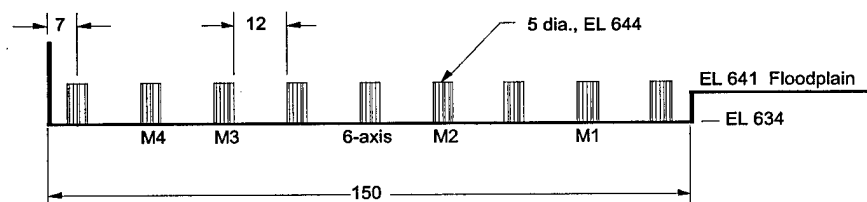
Elevation view of ICS consisting of nine 5-ft-diameter \times 10-ft-tall cylindrical piers with 12-ft gaps. Dimensions and elevations (EL) are prototype feet. Piers M1–M4 were equipped with single-axis load cells to measure downstream overturning moments, and a six-axis load cell to measured downstream and transverse moments and downstream force.
